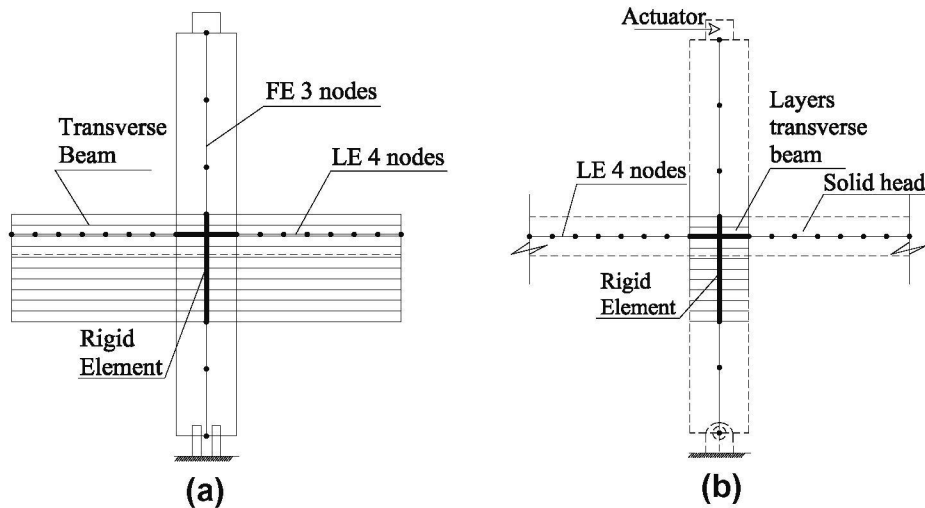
FEMs of the WFP–column connections with transverse beams (FE: frame elements; LE: layer-shell elements): (a) cross section perpendicular to the loading direction and (b) cross section in the loading direction.
